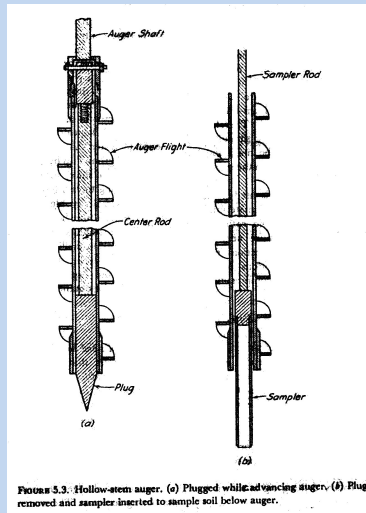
Hollow-stem auger. (a) Plugged while advancing auger. (b) Plug removed and sampler inserted to sample soil below auger.
